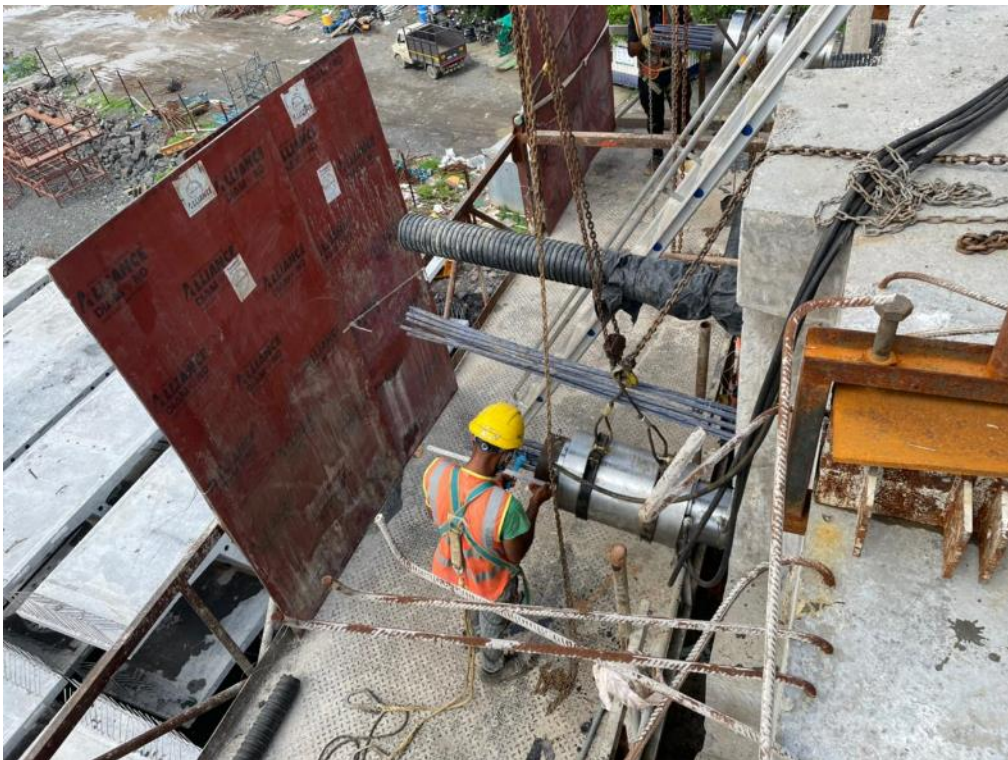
Span RMP 280-281 - 1st stage stressing work in progress
